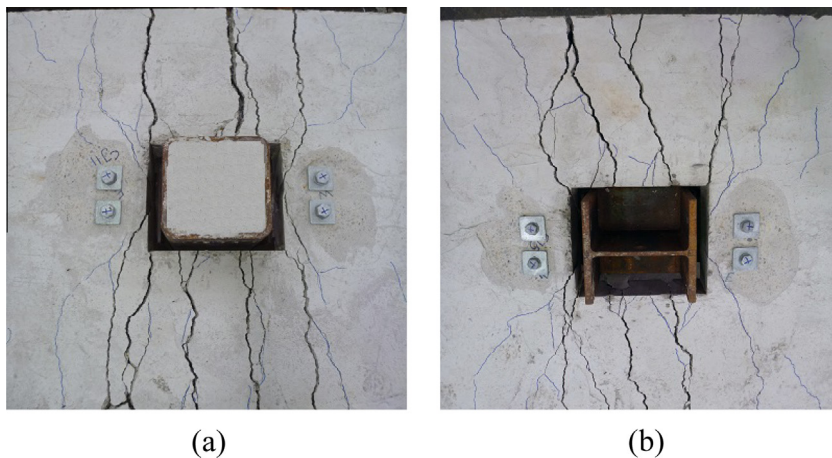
Typical pattern of cracks for specimens (a) CJ1 and CJ2 & (b) CJ3 and CJ4.
